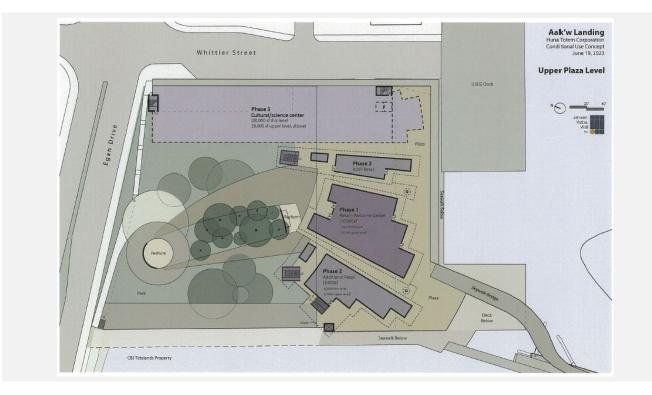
Overall site plan for the Upper Plaza area showing Phase 1, 2 and 3 development. Parking and additional retail are provided at lower levels.
